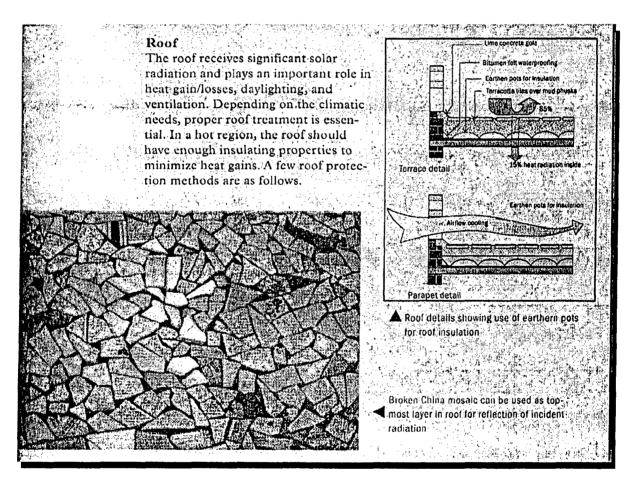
THE DETAILS OF ROOF FINISHES
